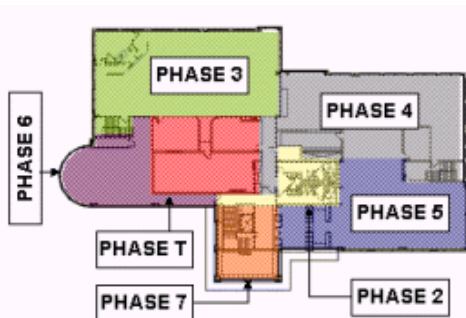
A floor plan of an office building, showing the stages of construction (Koo and Fischer, 2000). Zones for phasing plans contain every component of a certain type within a space or area.
